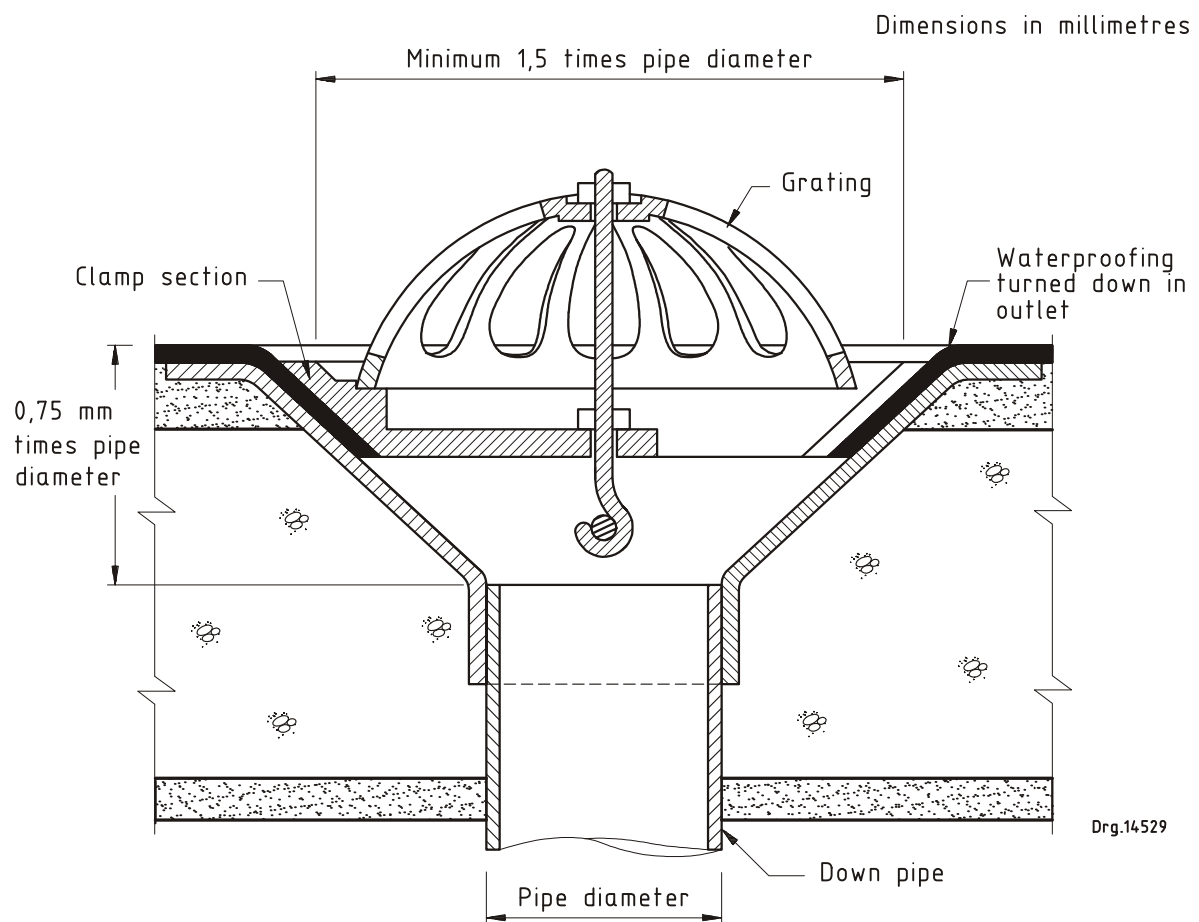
Storm and surface water outlet through concrete roof (proprietary design)
